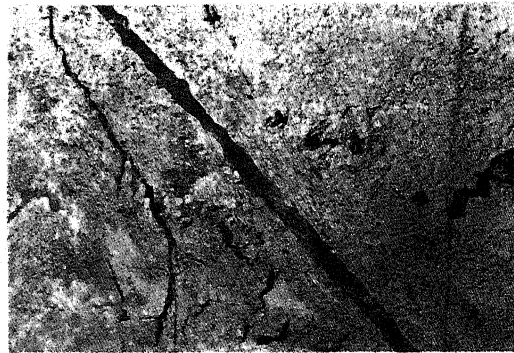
CRACK FORMATIONS IN EPOXY REPAIRED SHEAR WALL SPECIMENS
